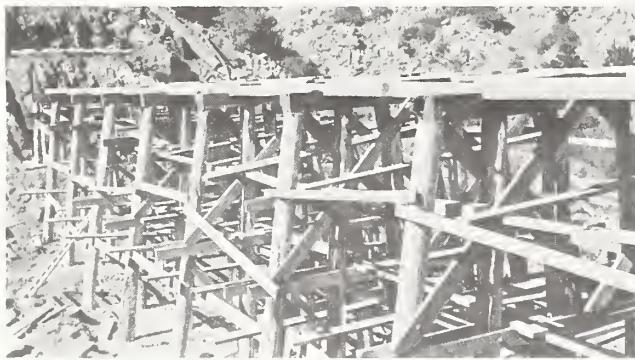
Details of typical railroad trestle construction are seen in this view of the Joaquin Canyon bridge. The vertical piles carried the load and the many braces, both lateral and longitudinal, provided stability under the moving loads of heavy trains. Photo by Yale Weinstein.
